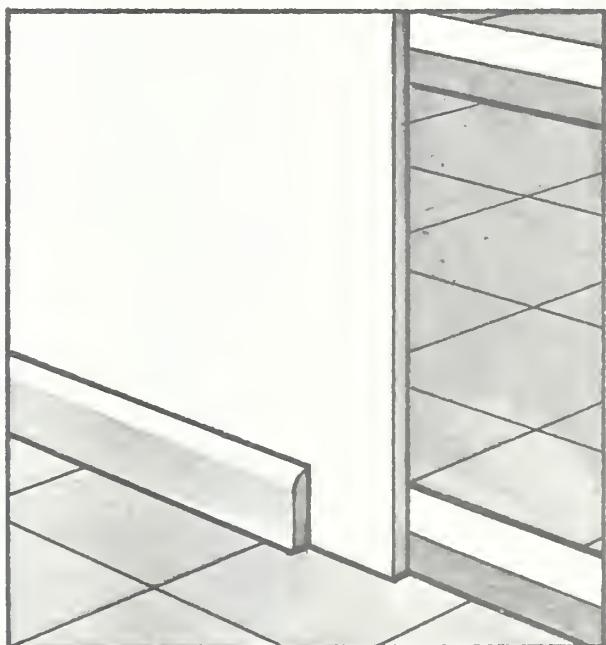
Timber at the bottom of the curtain wall is very close to the floor. This requires baseboard to be nailed below its centerline.
